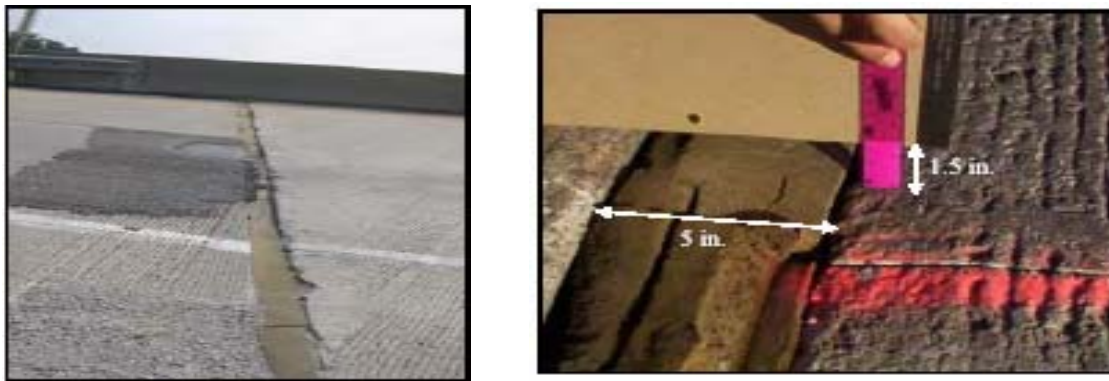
Uneven joint of approach slab and bridge deck (White et al. 2005)
